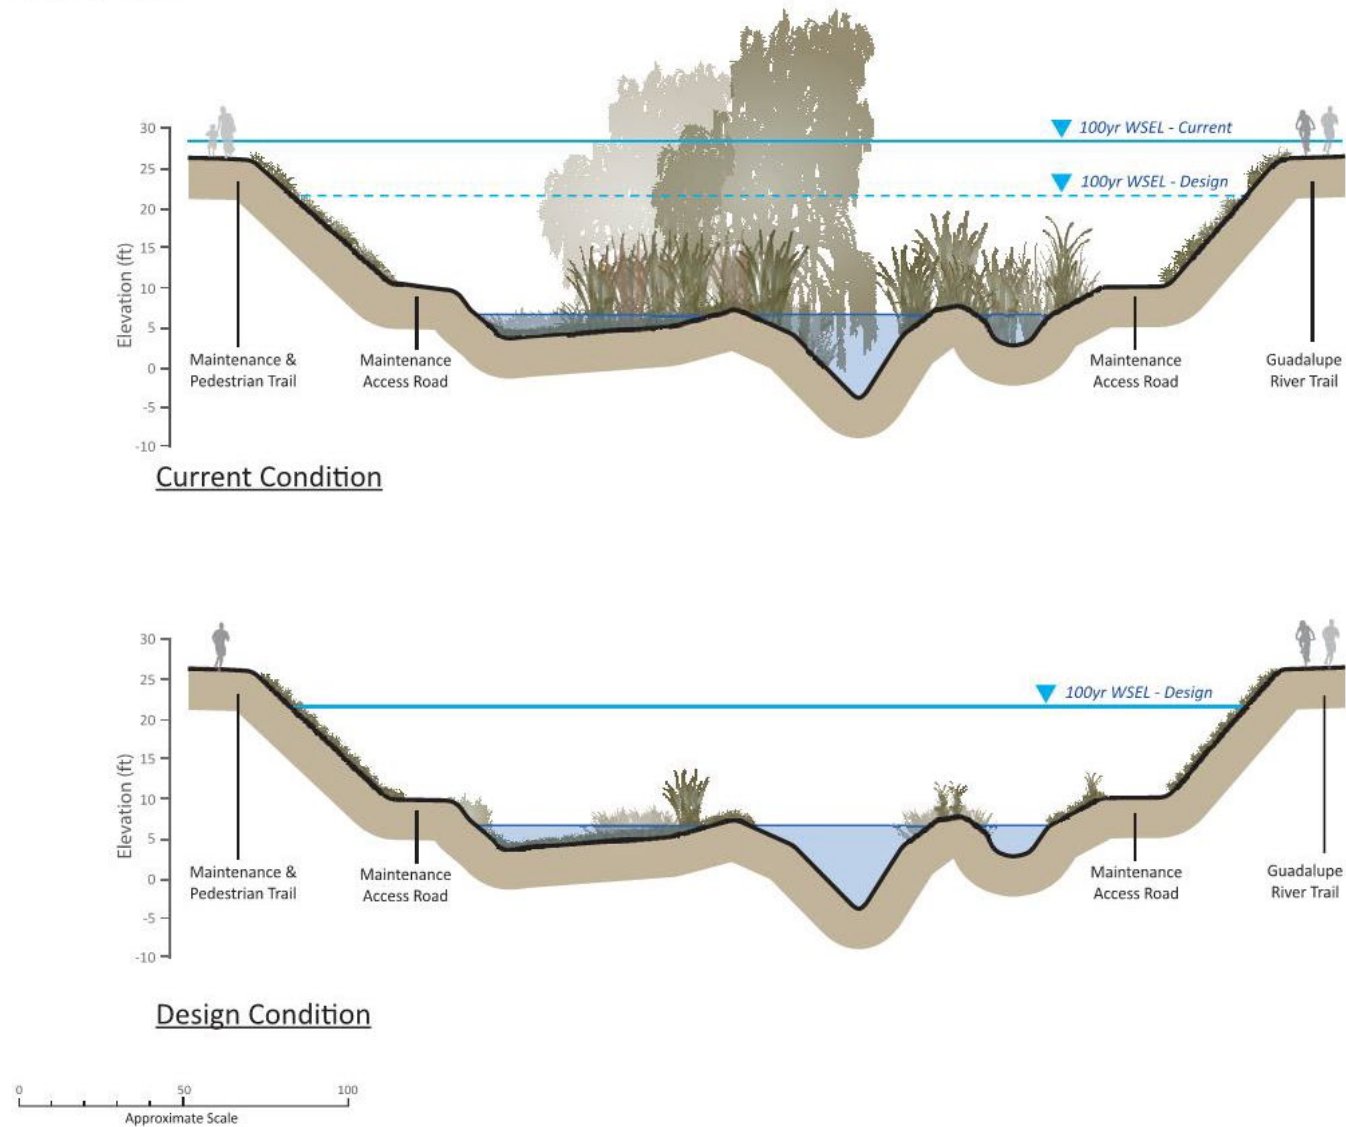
Typical Section - Montague Expressway to Tasman Drive
